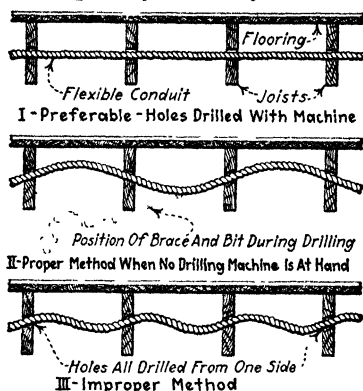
Methods of drilling holes in joists for flexible conduit.
